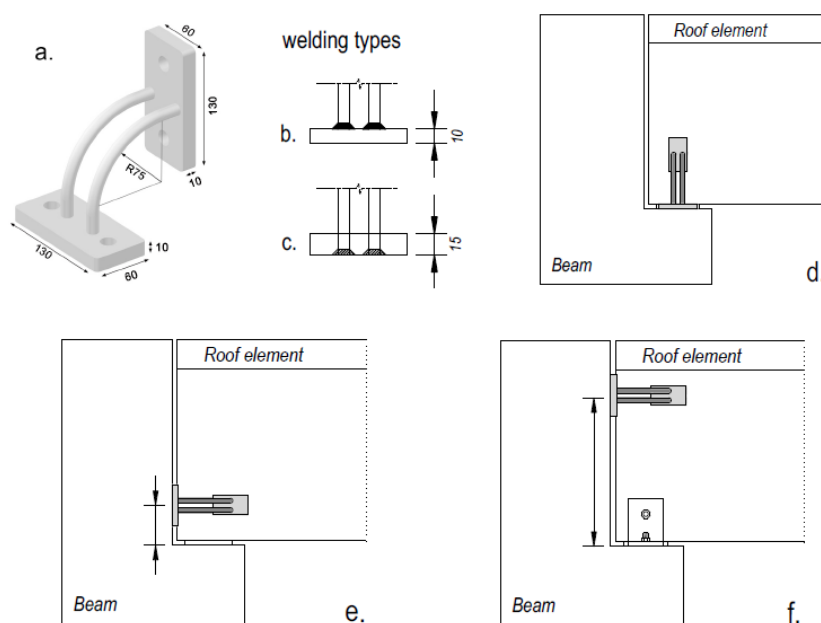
Arch shaped roof-to-beam connection and possible installation configurations (Belleri et al. 2014)
